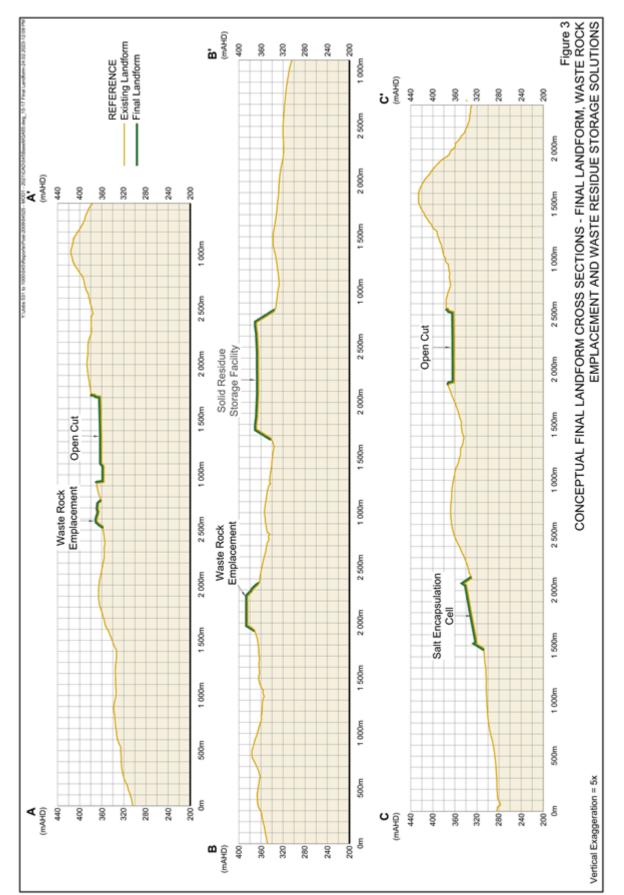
Conceptual Final Landform Cross Sections – Final Landform, Waste Rock Emplacement and Waste Residue Storage Structures
